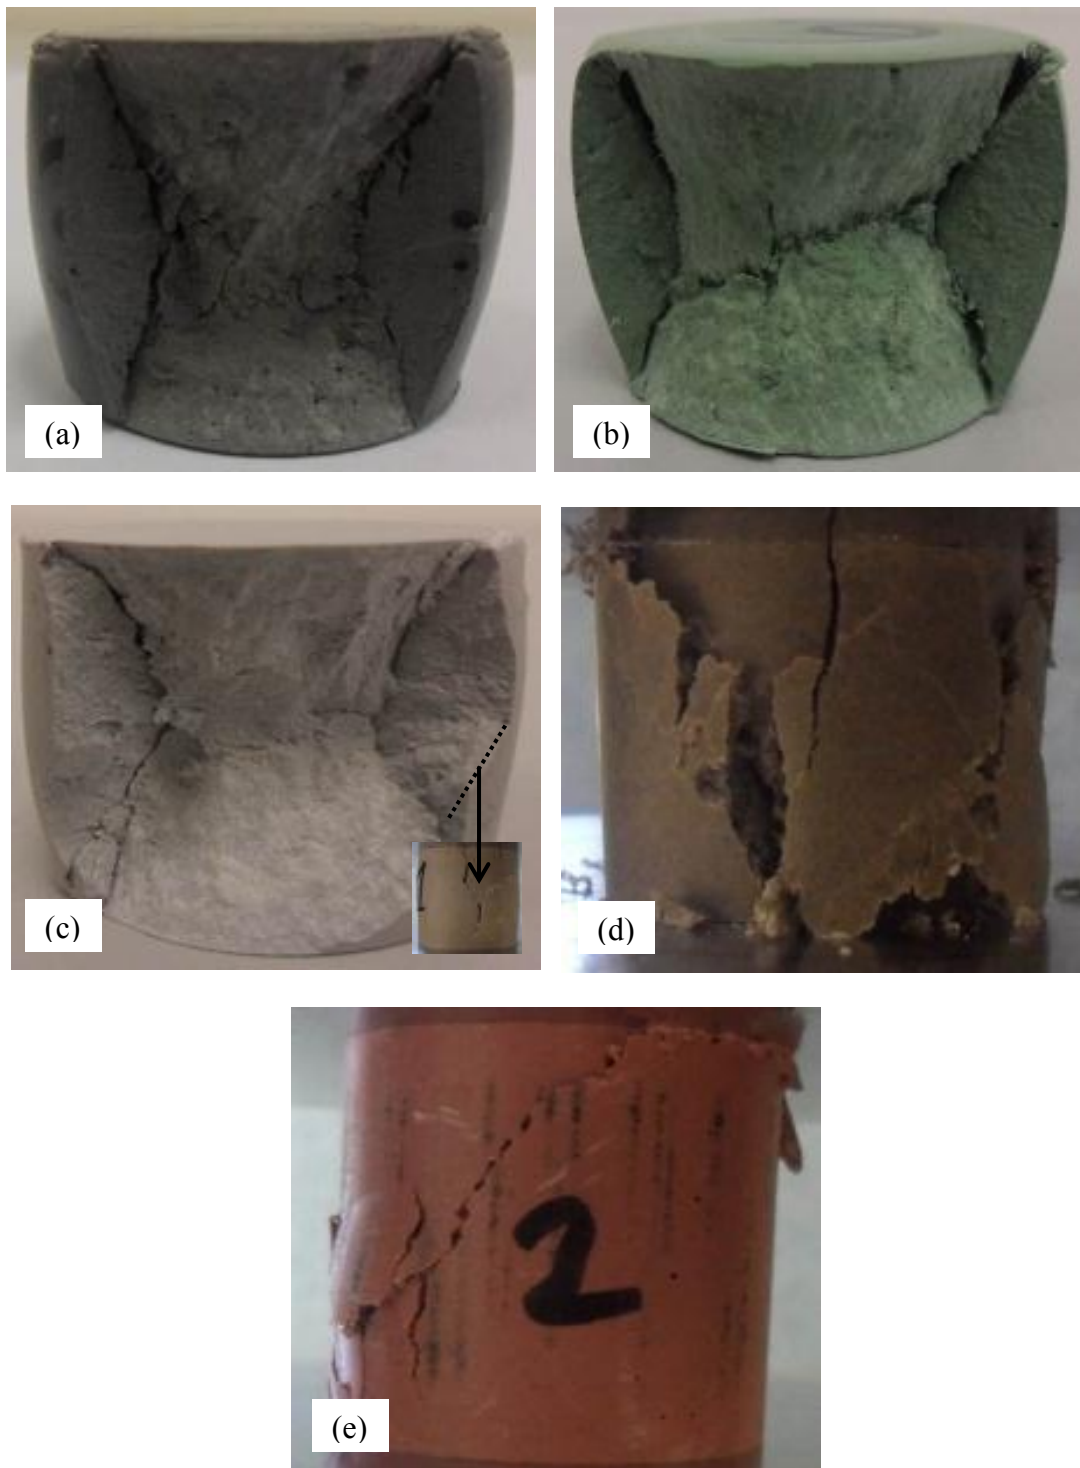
Failure patterns of grouts under compression; (a) grout A, (b) grout B, (c) grout C, (d) grout D and (e) grout E
